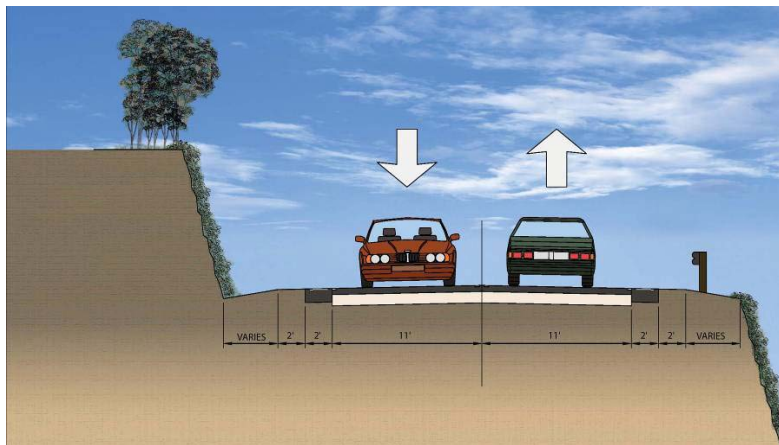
Typical Section for Alternatives 2A, and Sections of 1B—11' Lanes, 2' Paved Shoulders
